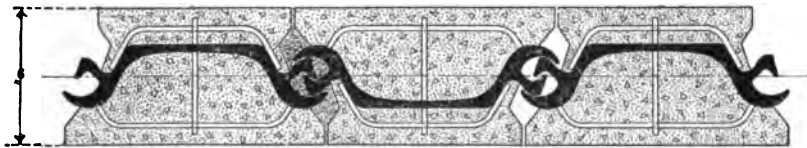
LACKAWANNA REINFORCED CONCRETE SHEET PILING.
